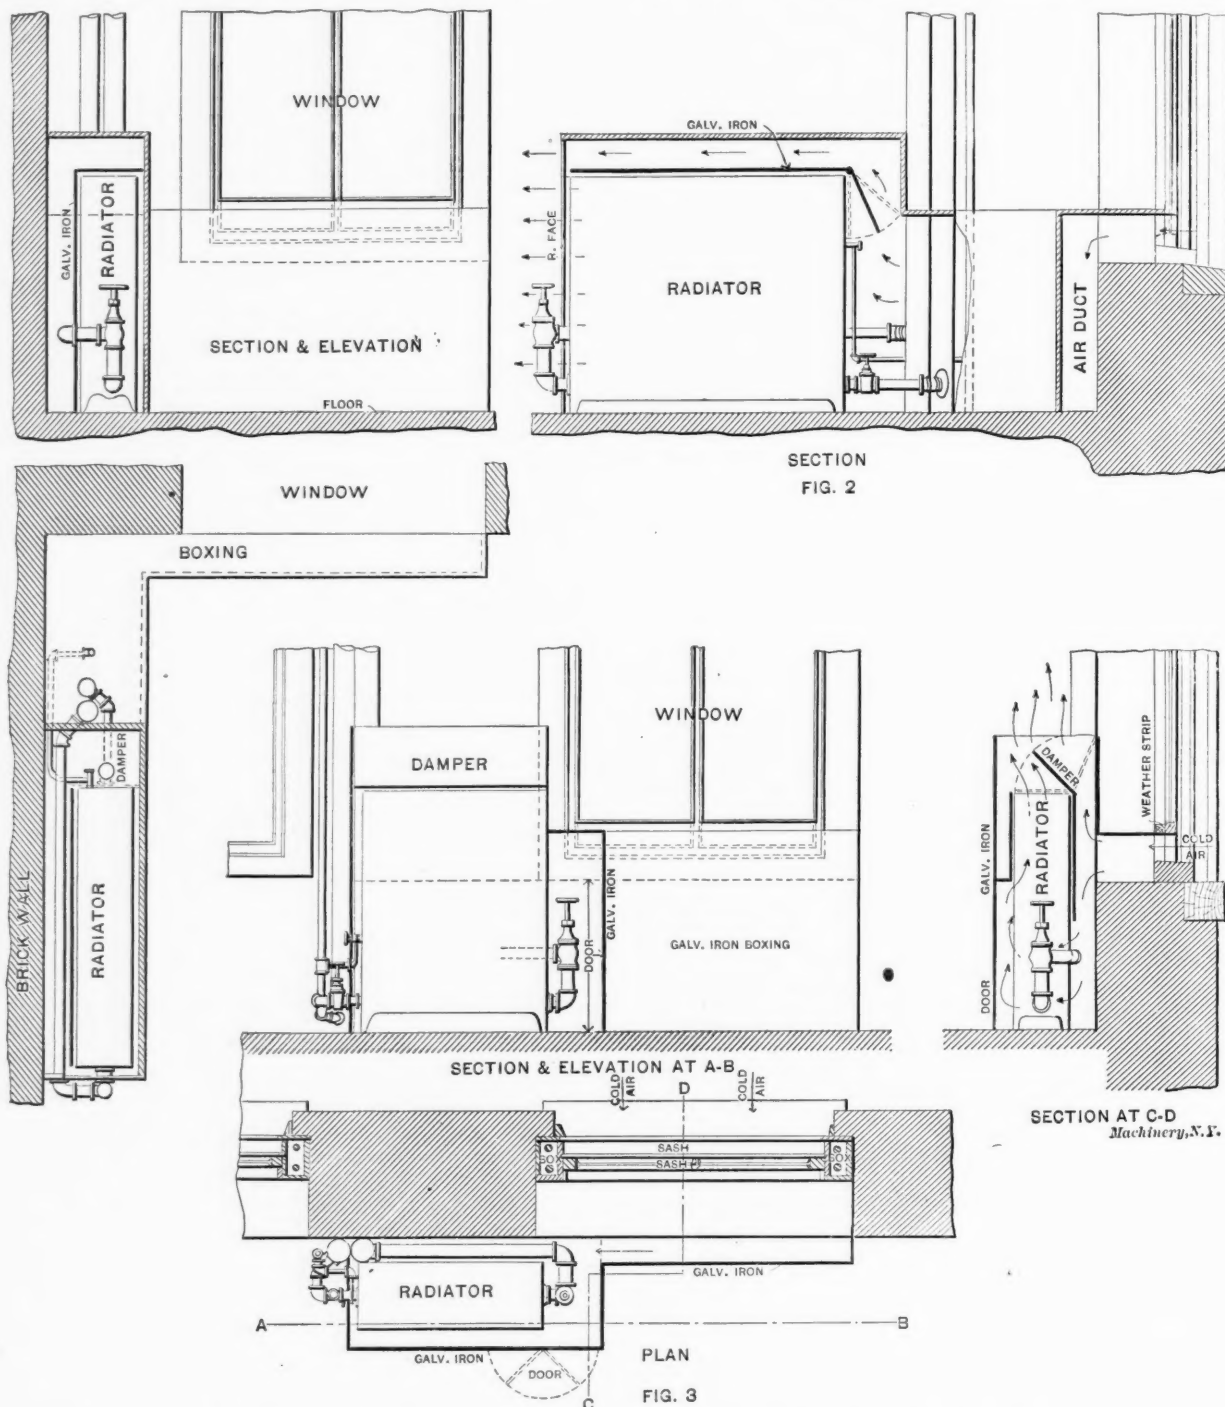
Arrangement used when the Radiator is placed along a Wall at Right Angles to the Window
